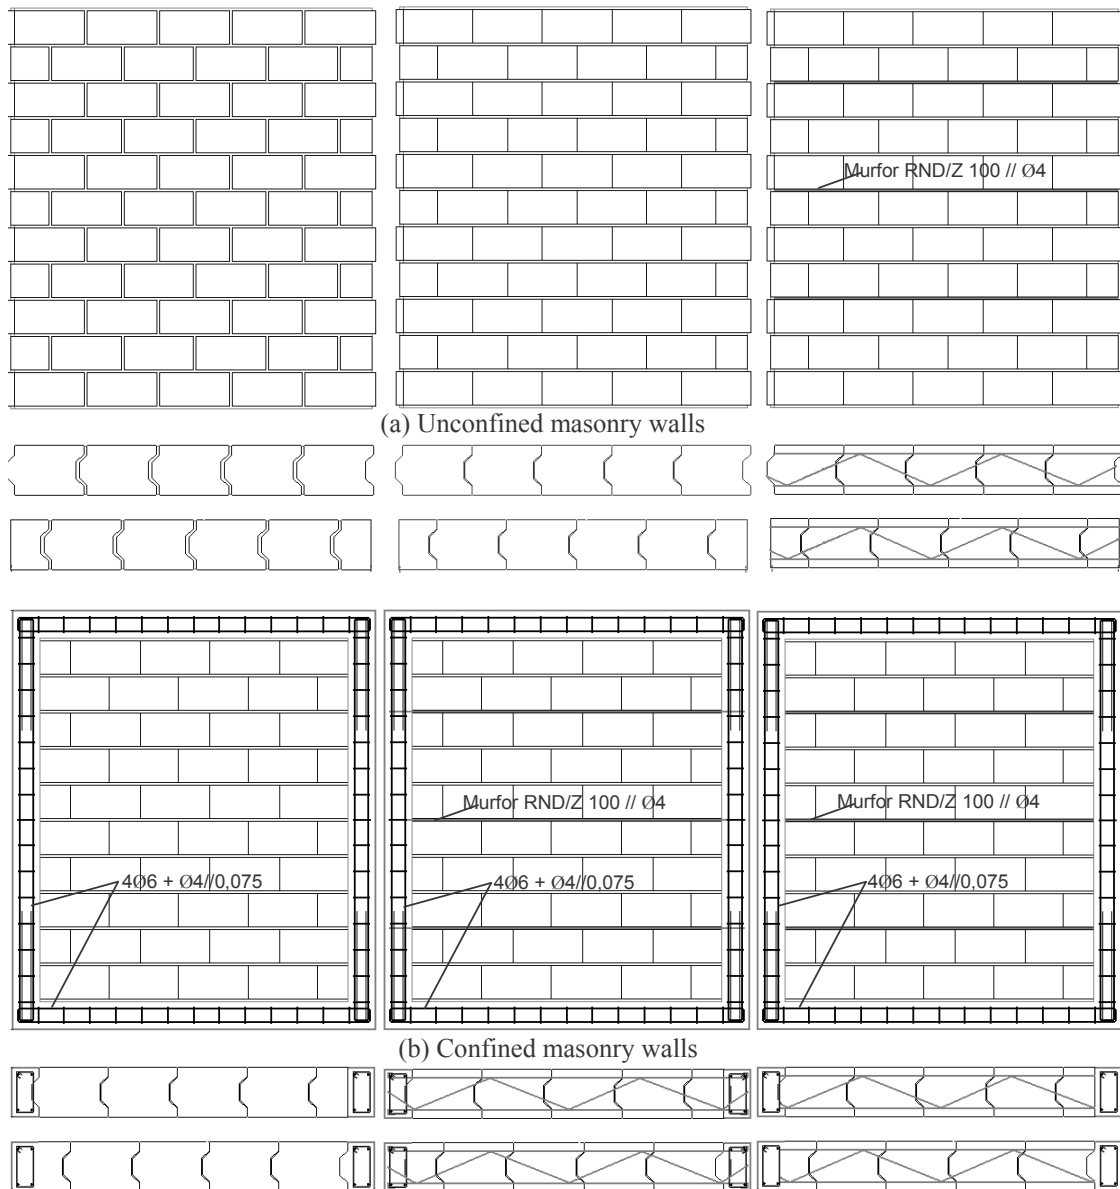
Lightweight concrete masonry walls; (a) unconfined walls; (b) confined walls
